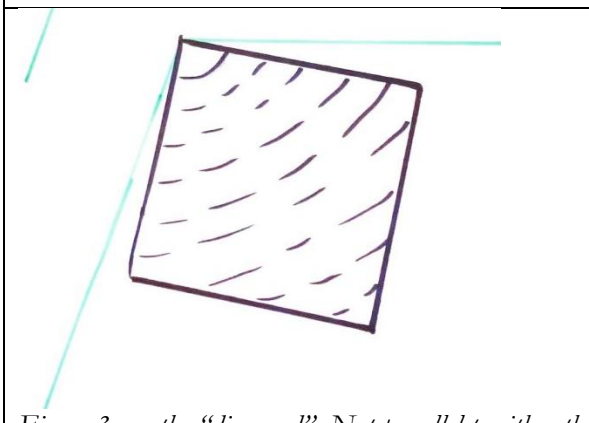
; on the “diamond”. Not parallel to either the Wall Plate or the Tie Beam
